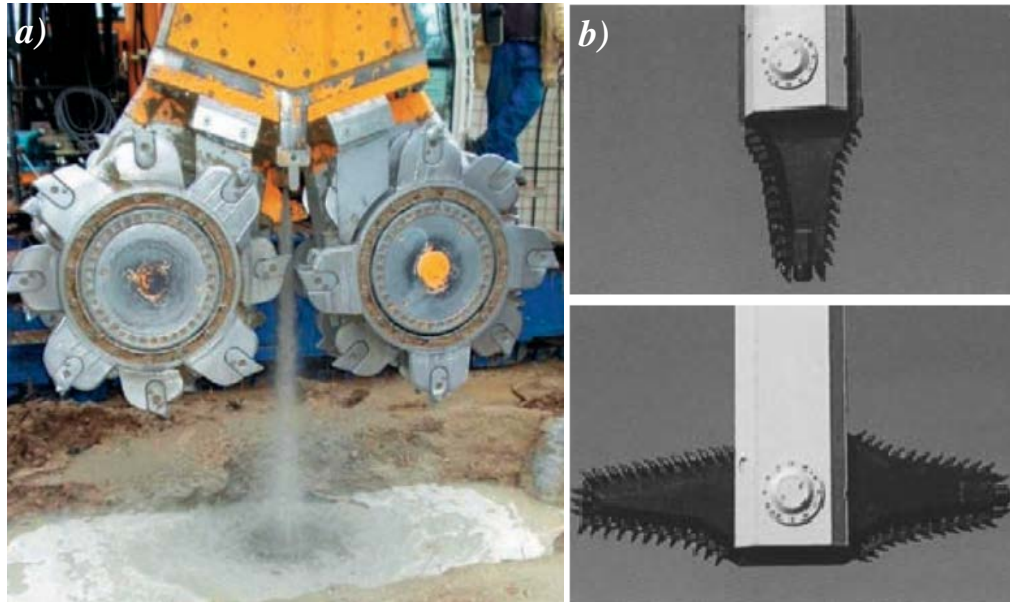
Examples of multi augers tools: a) cutter Soil Mixing by Bauer (Caltrans, 2010), b) blade used in Spreadable Wing method by SWING (Topolnicki, 2004)
